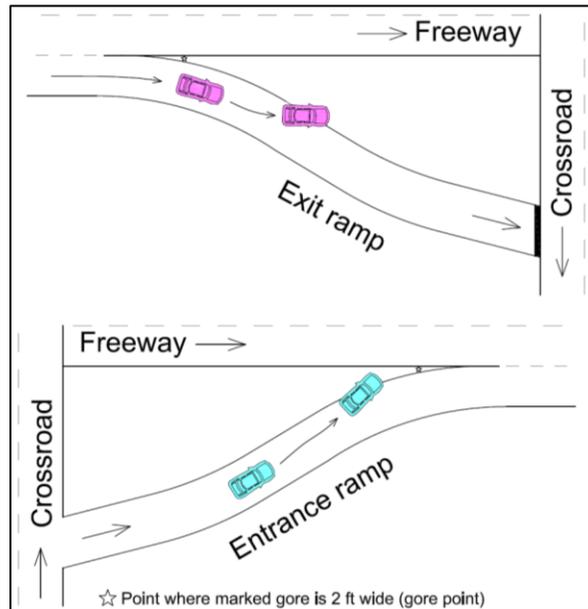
Run off the Road Crashes at Exit/Entrance Ramp Segments
